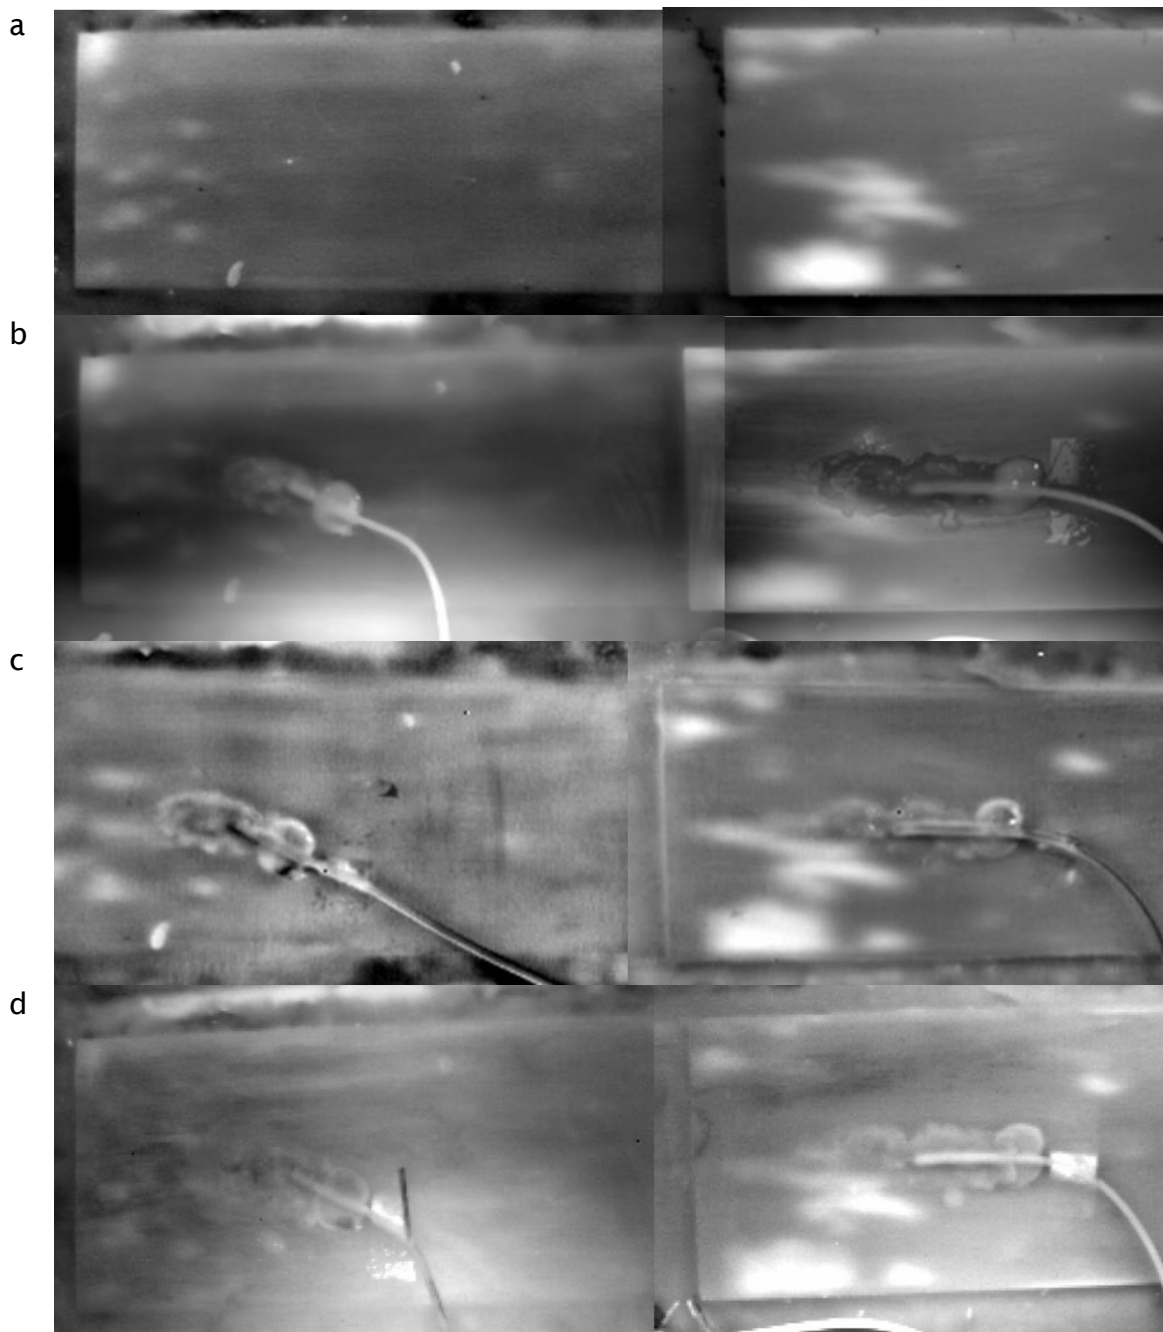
Bridge reinforcement side 2 – repeated visits a-d.
